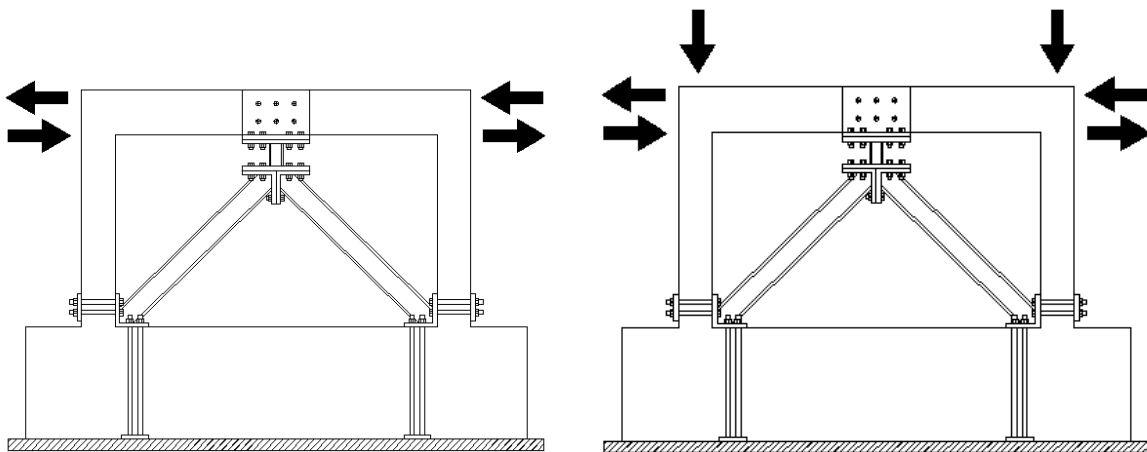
Specimens F2 and F2,N strengthened by steel bracing system and a steel link element at the top.
